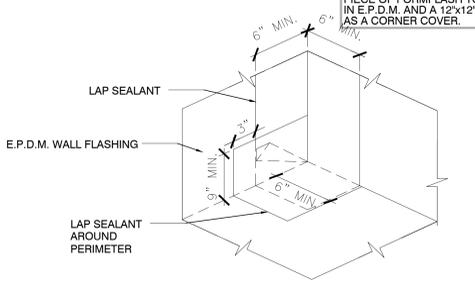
DETAIL SHOWN WITH CORNER COVER PIECE EXTENDING HEIGHT OF WALL. DETAIL MAY ALSO BE INSTALLED WITH ONE 6" WIDE PIECE OF FORMFLASH TO COVER BUTT JOINT IN E.P.D.M. AND A 12"x12" PIECE OF FORMFLASH AS A CORNER COVER.
